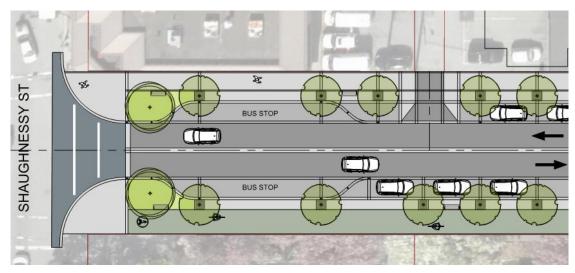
Typical layout of MUP on South Side and Parallel Parking on Both Sides
